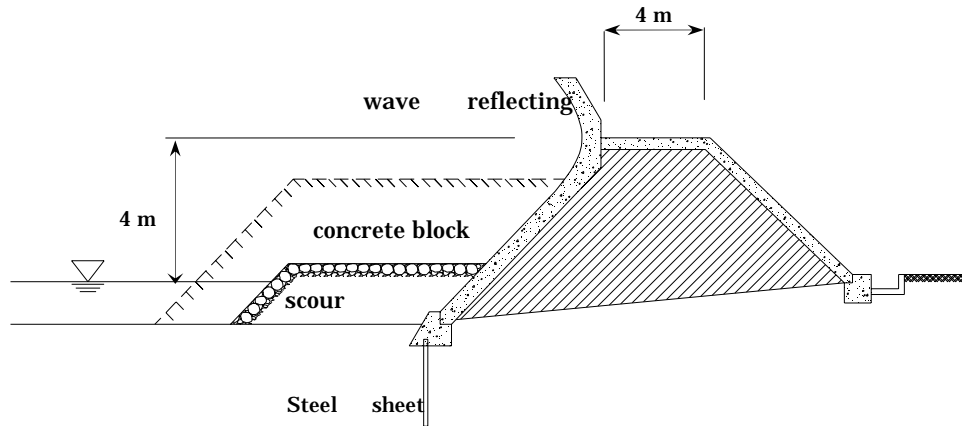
Typical Cross Section of Detached Breakwater (Composite Wall-type)
